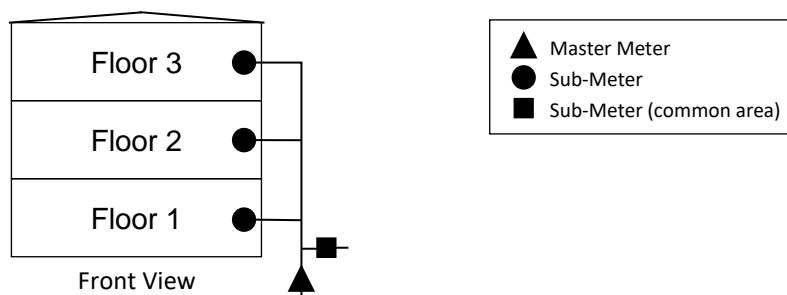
Sub-metering Configuration for Apartment Buildings
